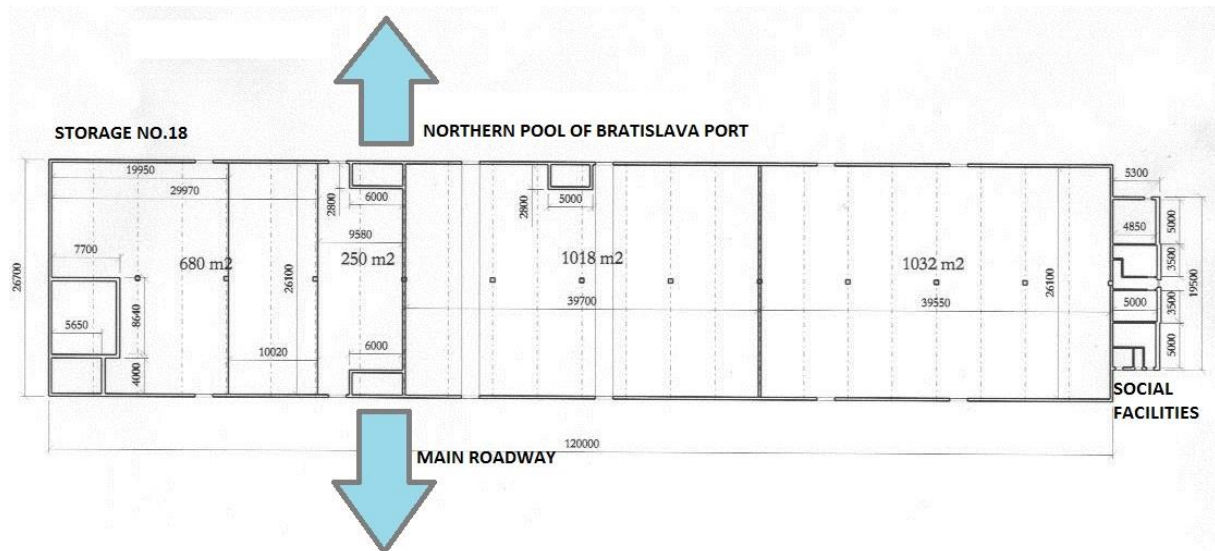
Technical drawing of storage no.18 and its position towards northern pool of port, where quay for barges, rails and crane is situated (Source: own editing).
